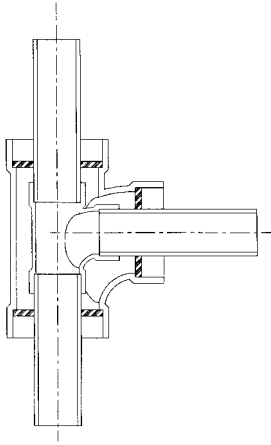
Example of thermoplastic sanitary tee using molded code approved carrier fitting. (*Orion Fittings, Inc.*)
